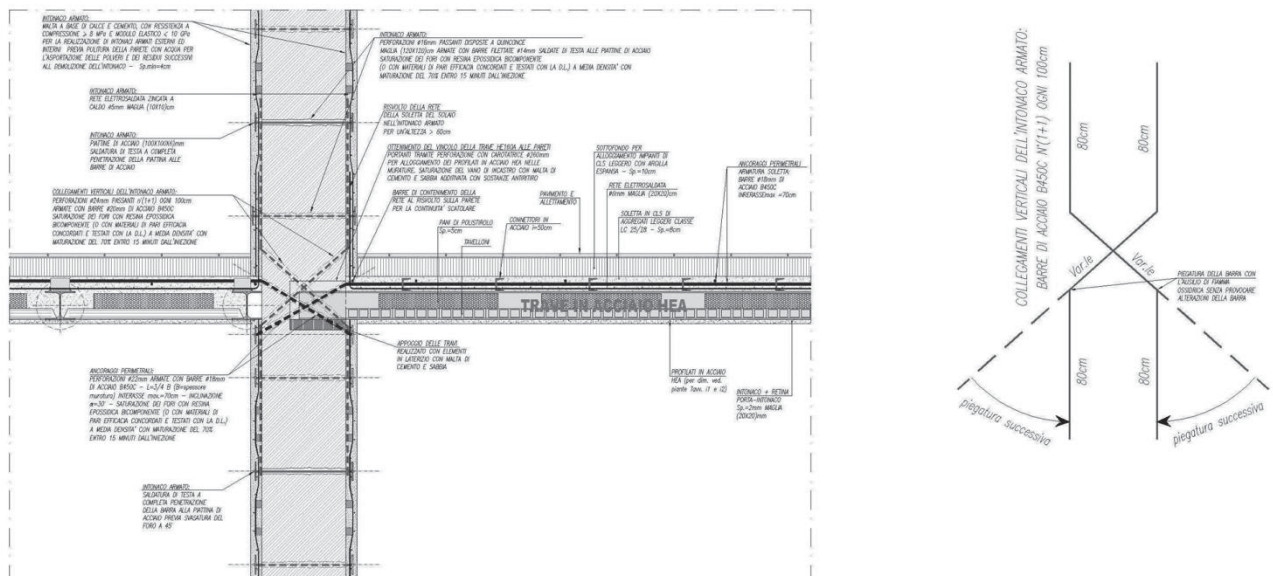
Vertical connection between reinforced mortar and internal masonry pier in correspondence of a steel slab (original drawings by Massimo Mariani)
